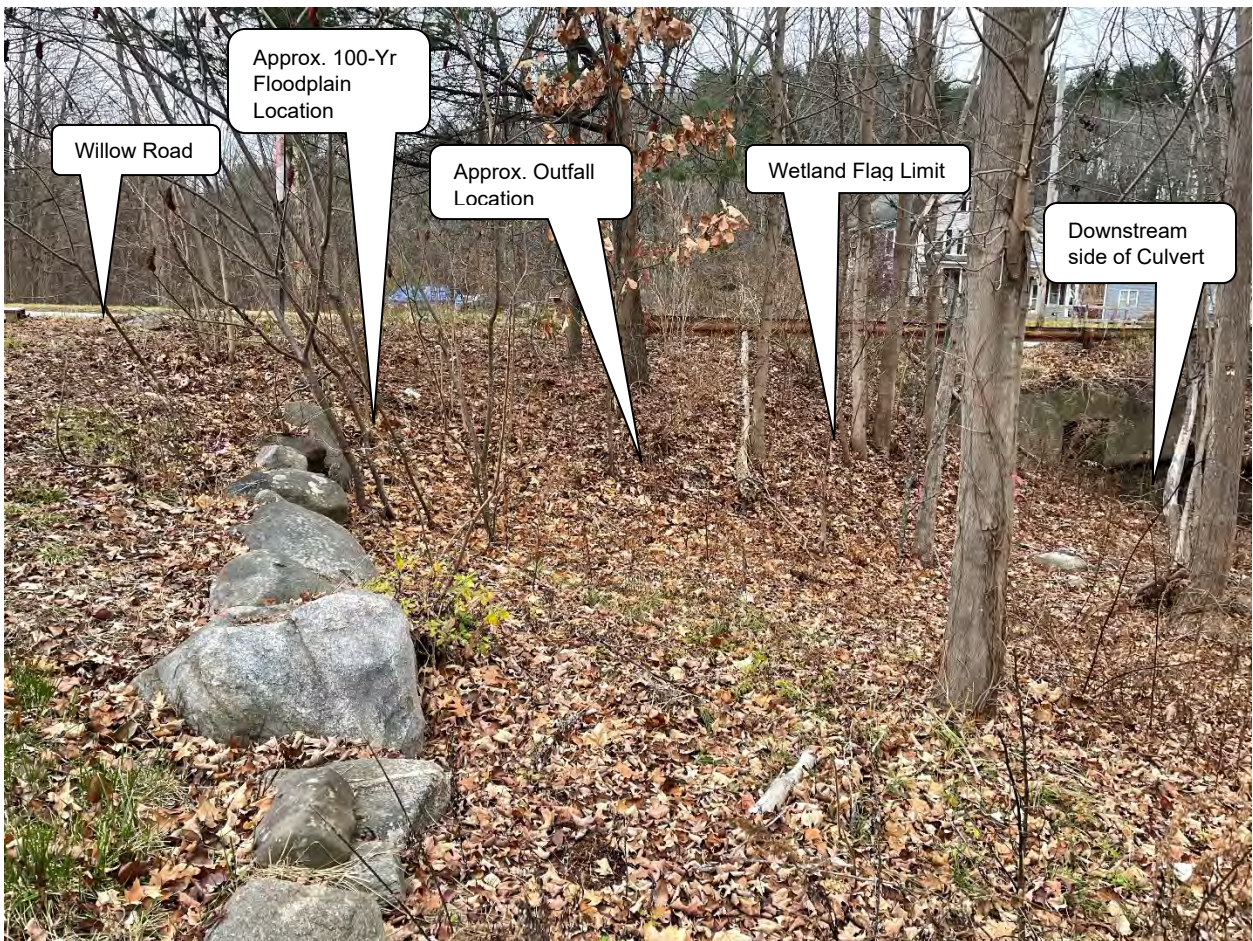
Downstream Side of Culvert at Bennetts Brook
